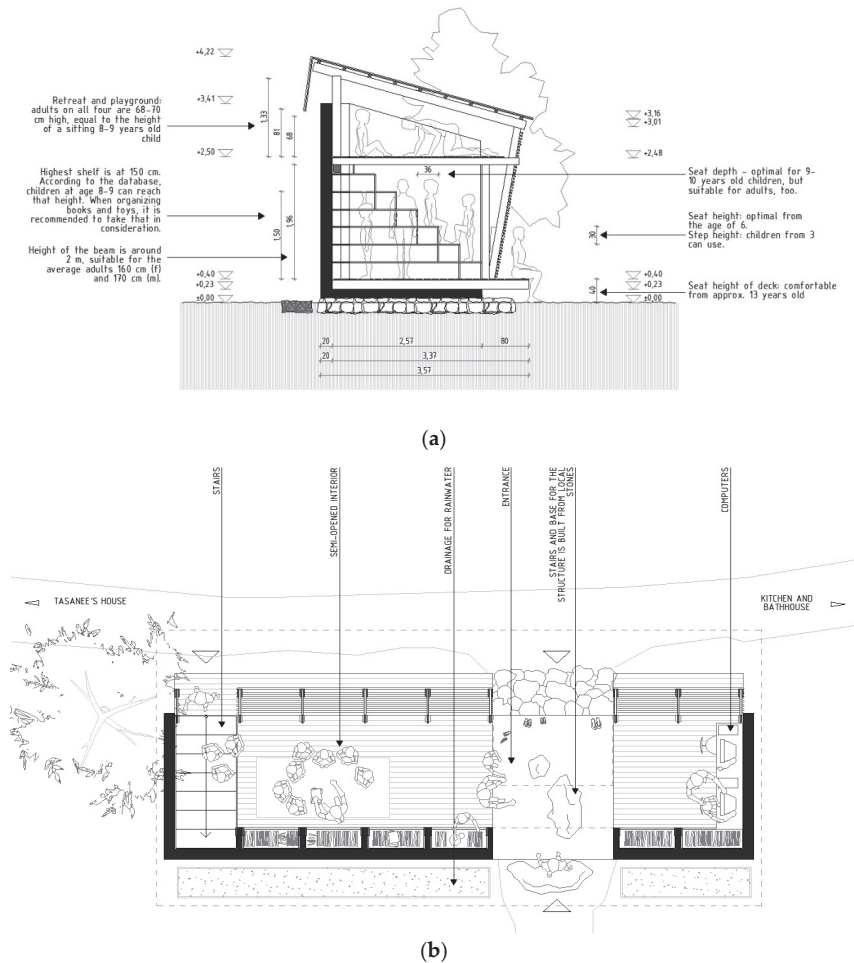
(a) Cross-section and (b) floor plan of the Library. Figures: Own drawings of the author (Mizsei, A.) based on TYIN Tegnestue Architects (Andreas G. Gjertsen, Yashar Hanstad), Available online: <http://www.tyinarchitects.com/> (accessed on 13 July 2021).
